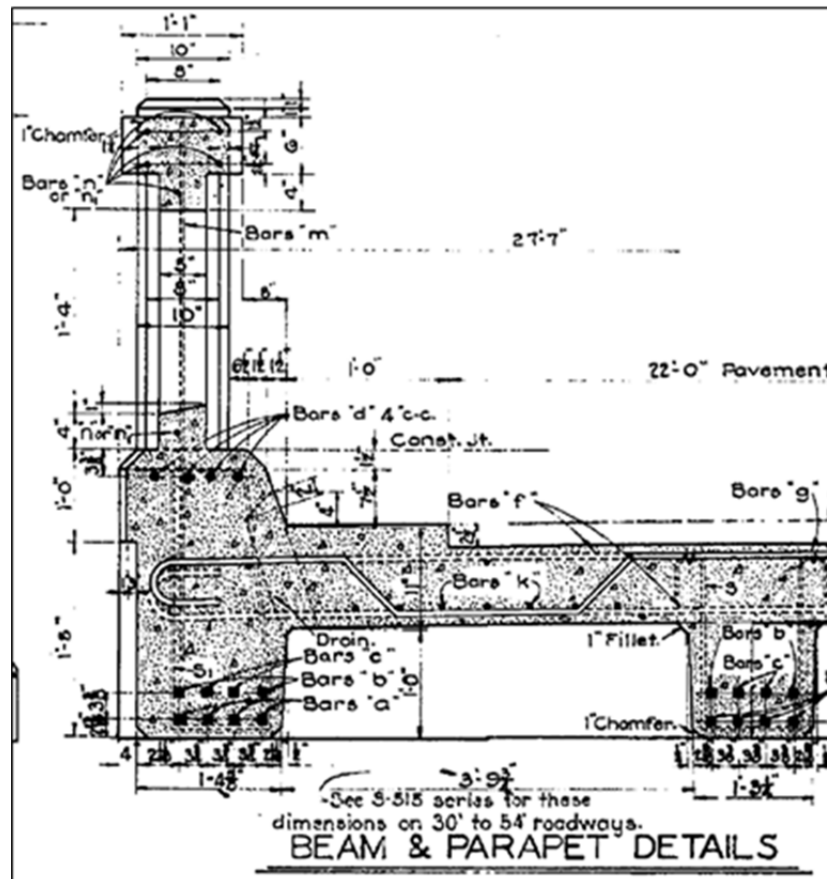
Cross-Section Details of Concrete Post and Beam Railing with Concrete Pickets
